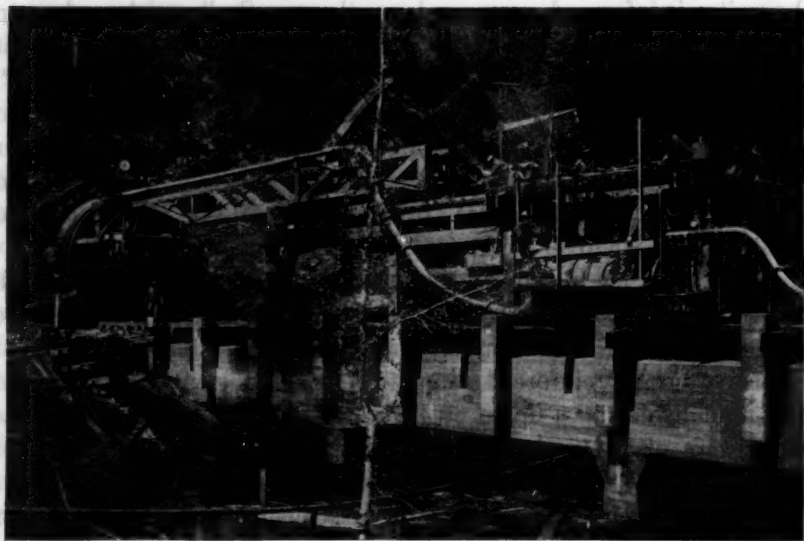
CONCRETE GUN AT PIT RIVER NO. 3 TUNNEL, CALIFORNIA
